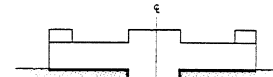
(a) SASSI Foundation Model for Auxiliary Building
